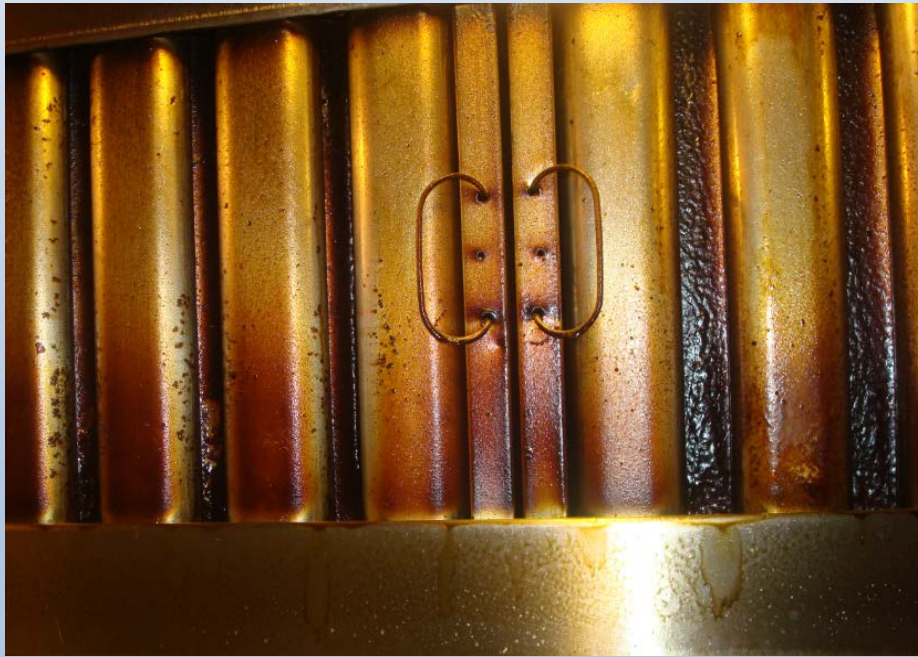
View of west kitchen exterior wall corner post located at the fire area of origin.
